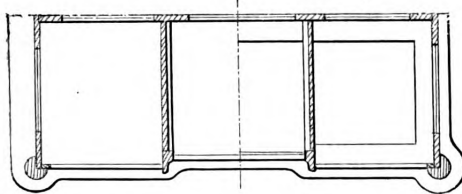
Section Taken on the Line A B.—Scale, $\frac{1}{2}$ Inch to the Foot.
